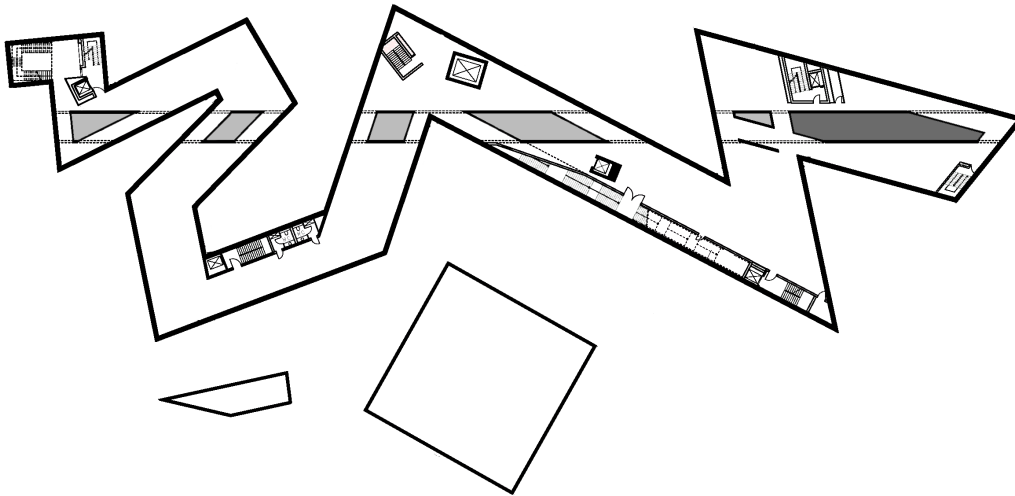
Location of the voids (*Floorplan First Floor, 2015*)
